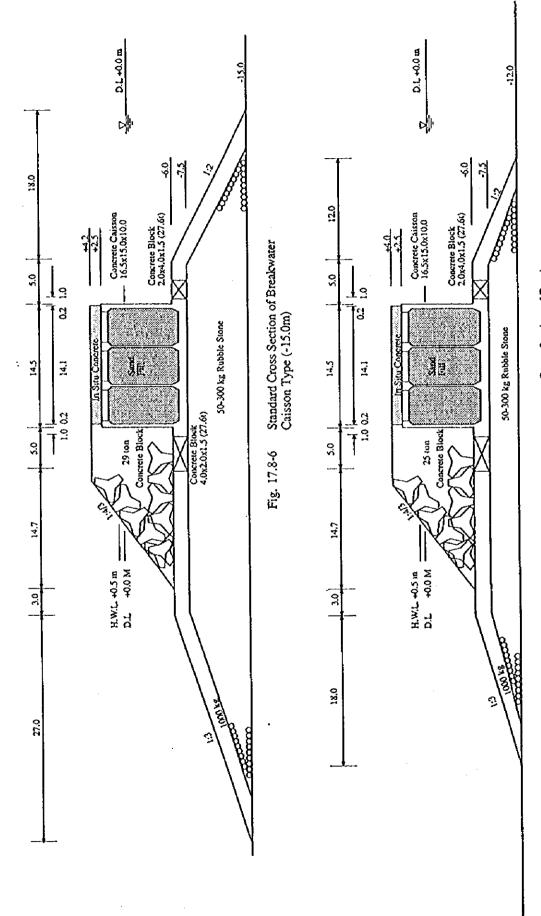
Standard Cross Section of Breakwater Caisson Type (-12.0m)
